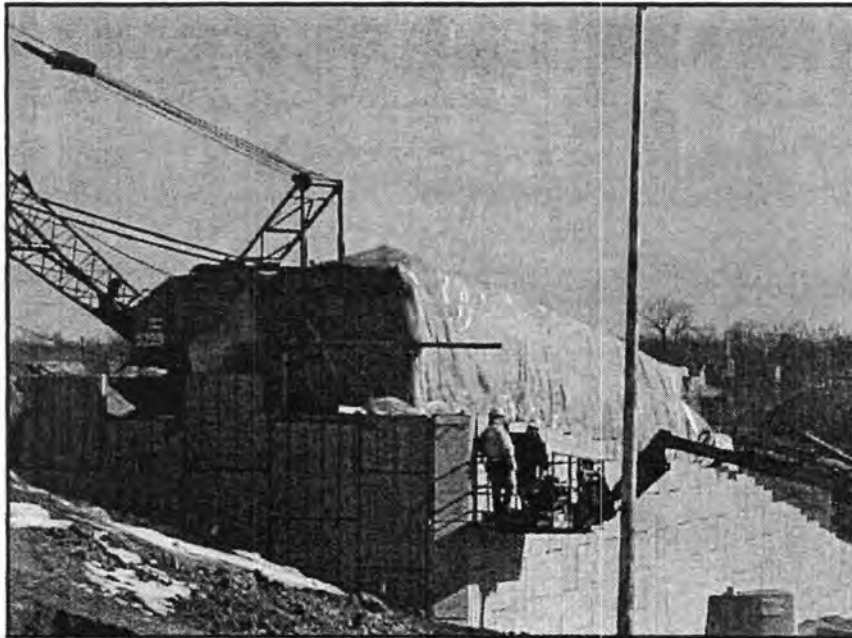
Picture showing MSE wall at 3rd St Bridge (North of I-235)
